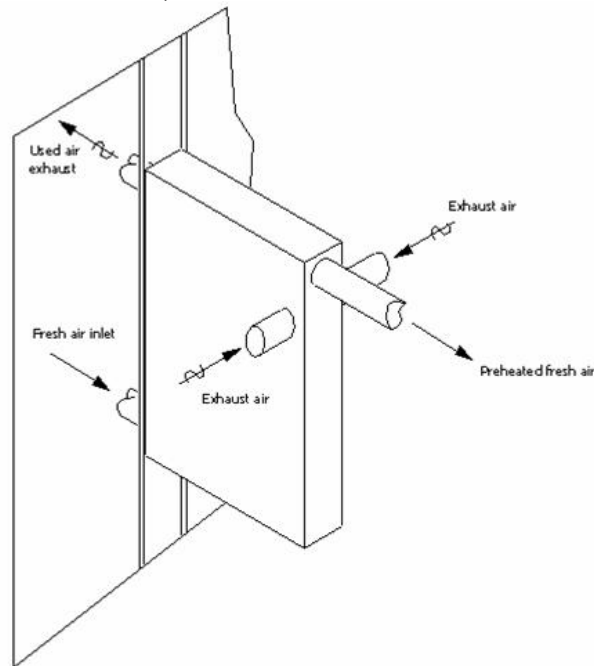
Interior partition wall in which an only 20 cm thick a heat recovery / air heating unit and ventilation pipes can be installed.
